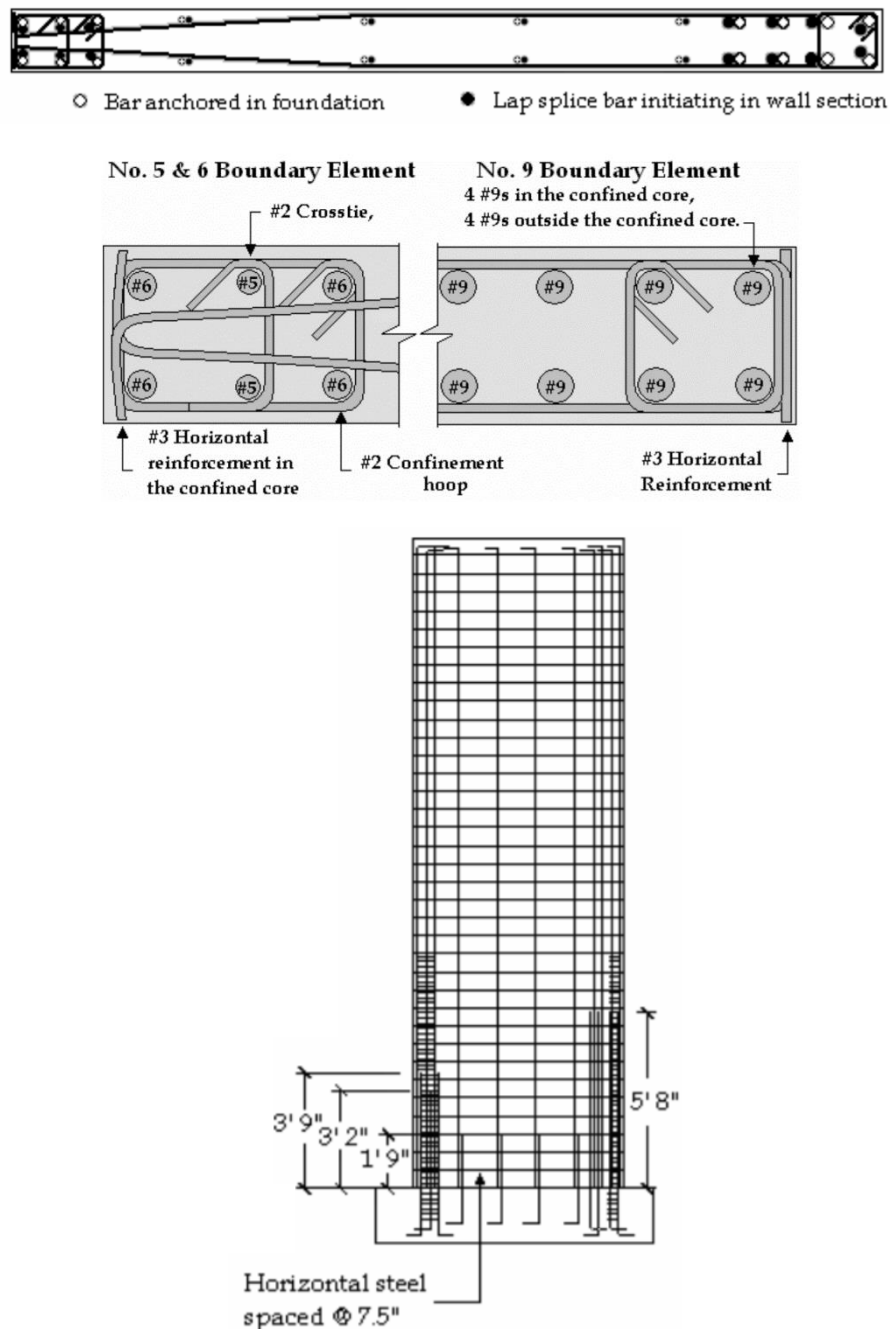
Details of wall tested by Johnson et al. (2007) – <https://datacenterhub.org/resources/138>
